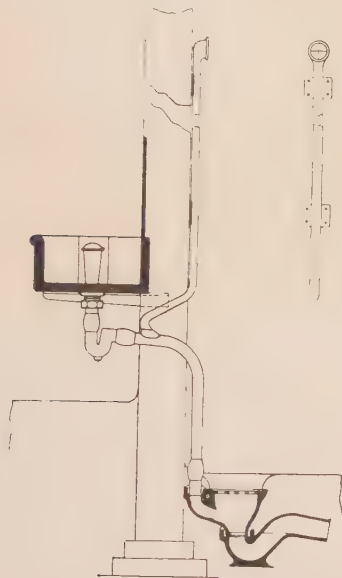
Sink with Trapped and Ventilated Waste discharging into Back Inlet Gulley.
